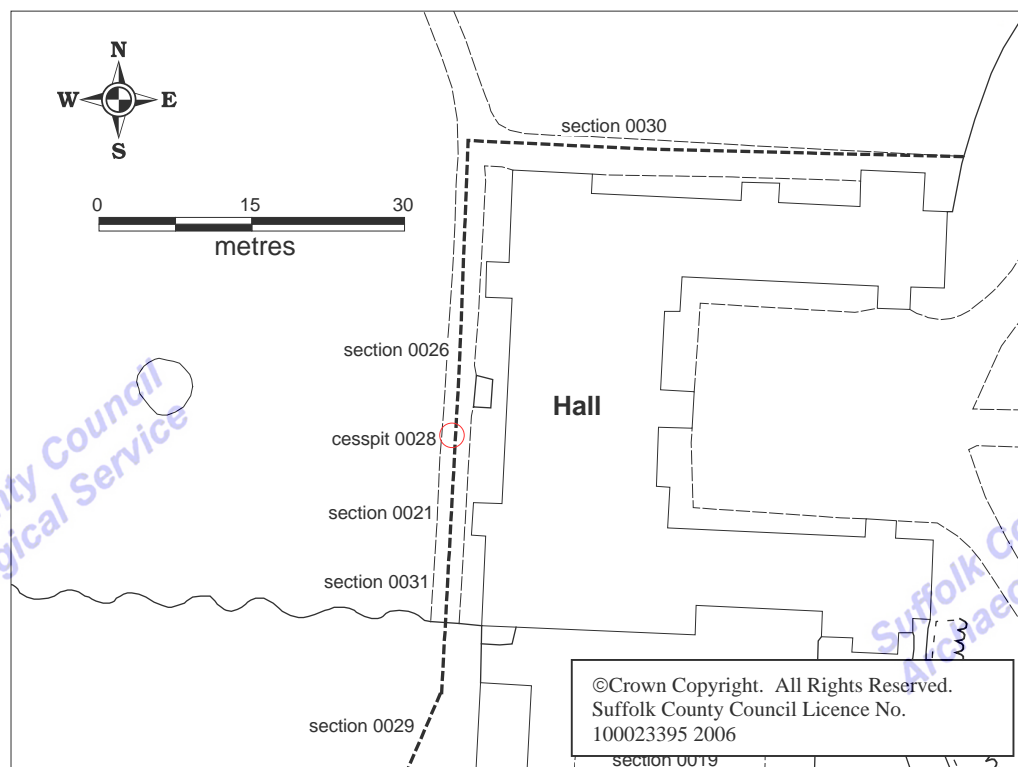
Plan showing drain runs alongside the west and north elevations of the hall
